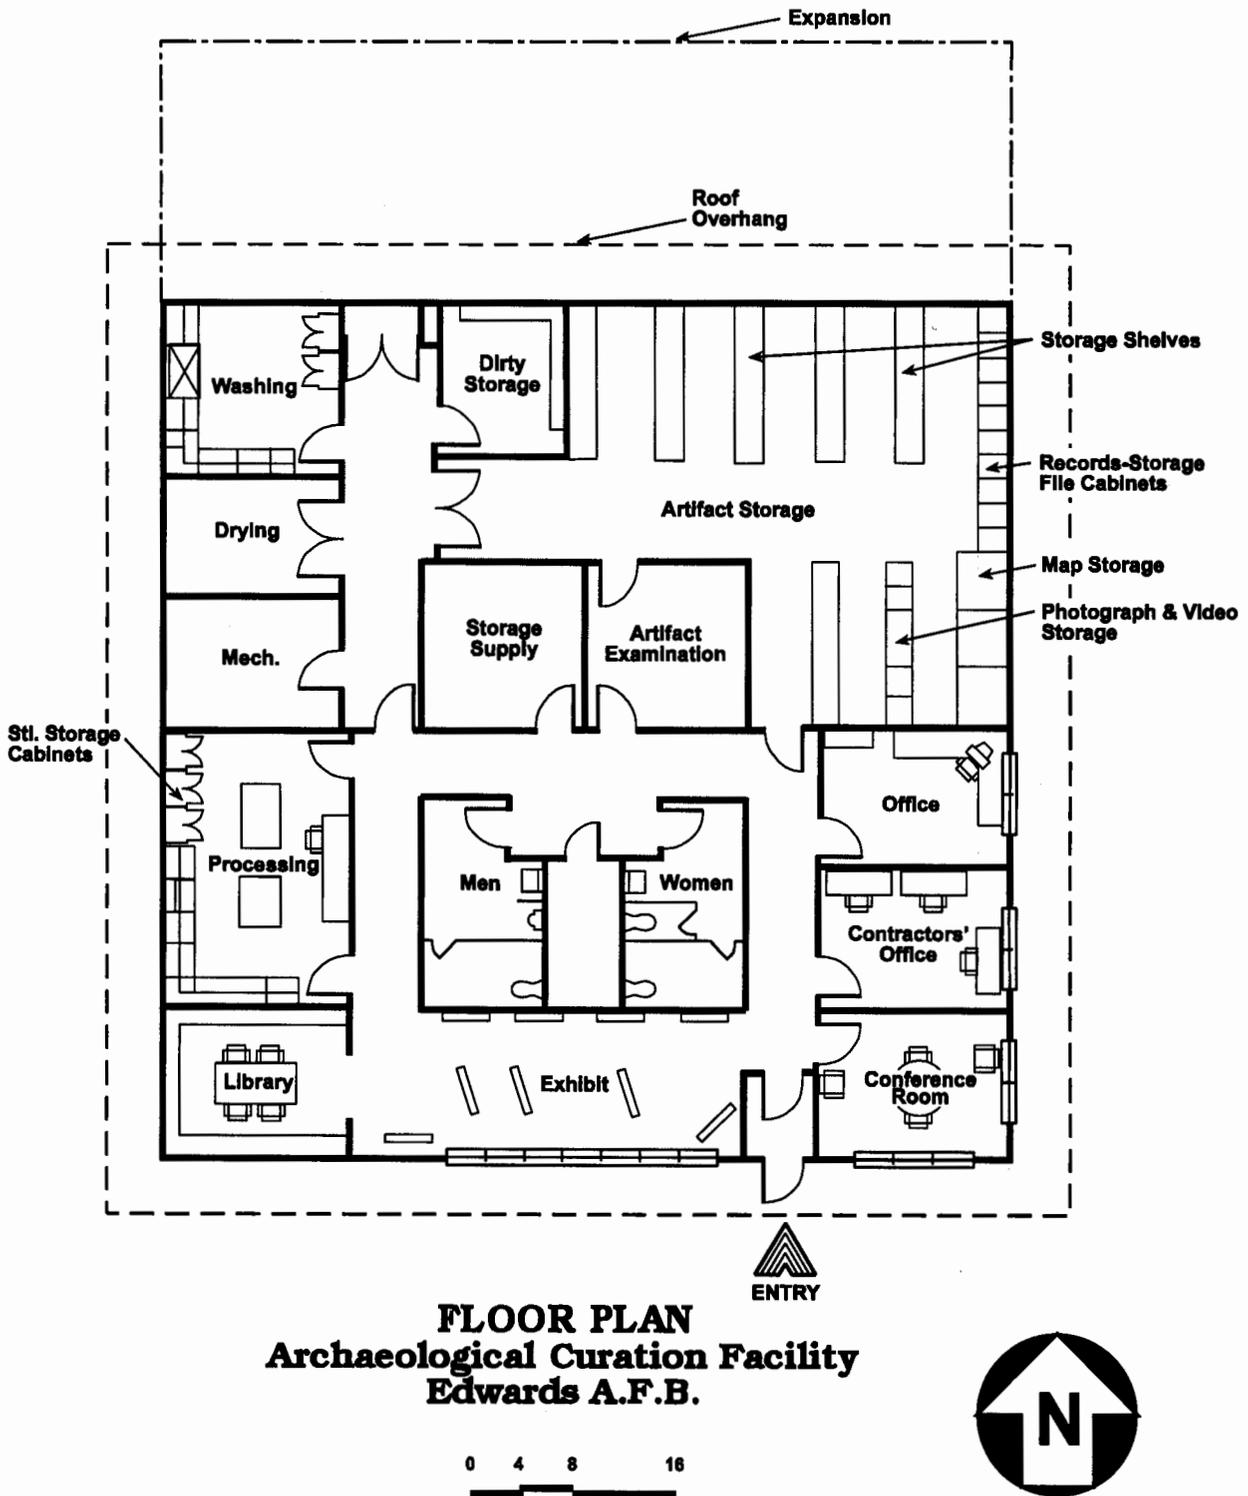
Proposed floor plan for a new archaeological collections facility at Edwards AFB.
